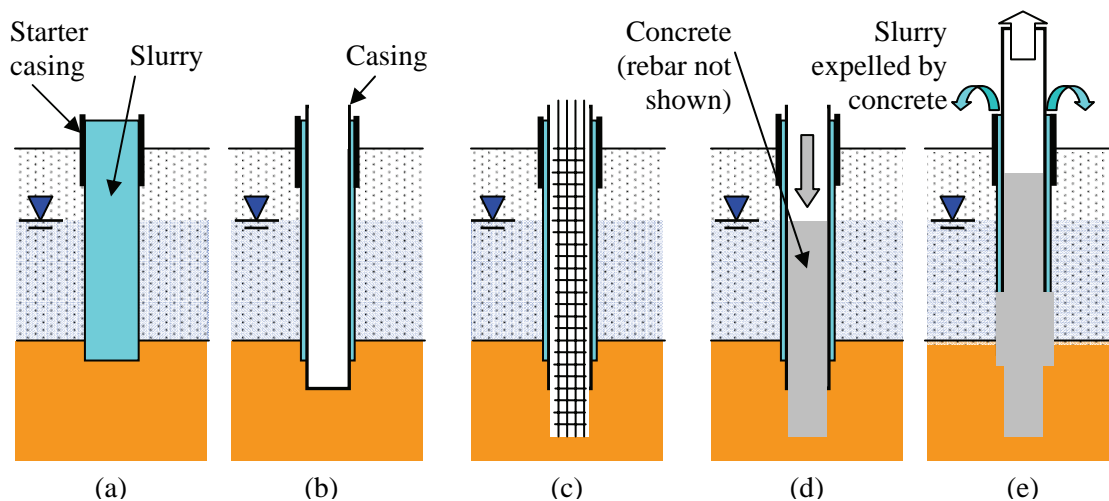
Construction Using Casing Through Slurry-Filled Starter Hole: (a) drill with slurry; (b) set casing and bail slurry; (c) complete and clean excavation, set reinforcing; (d) place concrete to head greater than external water pressure; (e) pull casing while adding concrete
